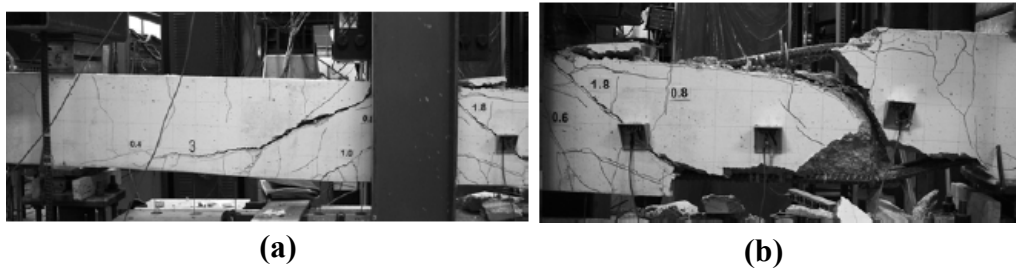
View of Beam SS1b-2 after Test: (a) North Half; (b) South Half
